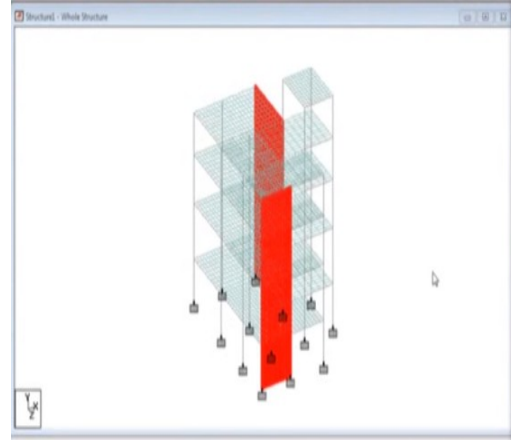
SHOWS THAT APPLIED THE LOADS OF FRONT WALLS
